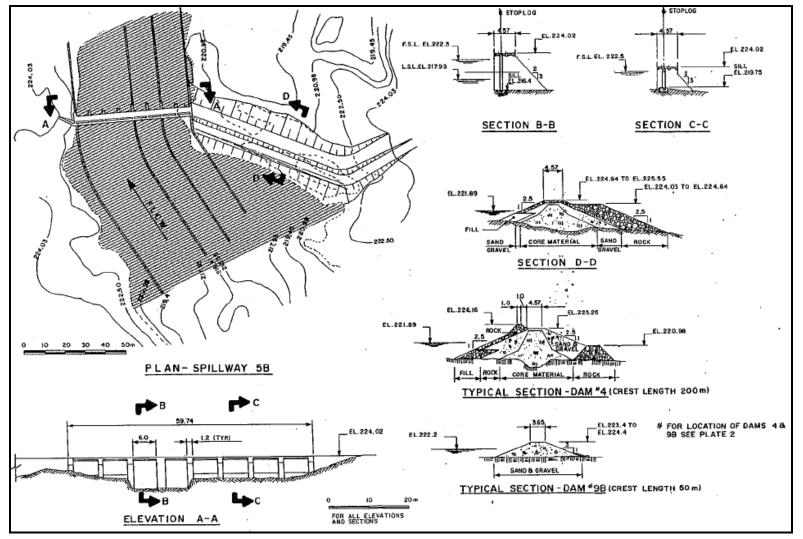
Spillway 5B, side Dam 5B, 4 and 9B – Layout and Typical Sections
